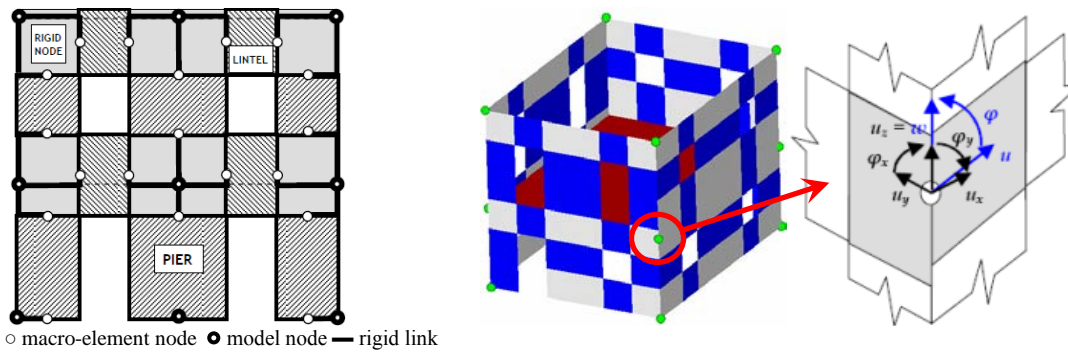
Wall discretization and tridimensional assemblage of a building [adapted from Galasco *et al.*, 2004].
